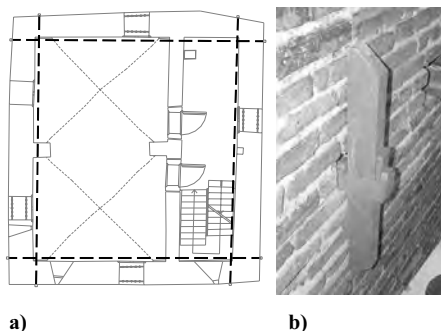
Positioning of stainless steel ties, Vanga tower (Trento): a) tie positioning, plan; b) view of the external anchor.
